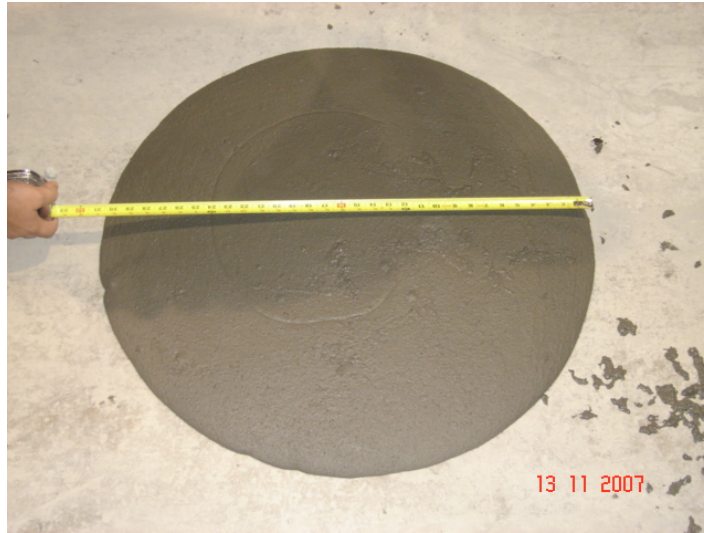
Slump flow test for HSC concrete used in pouring I-girders
